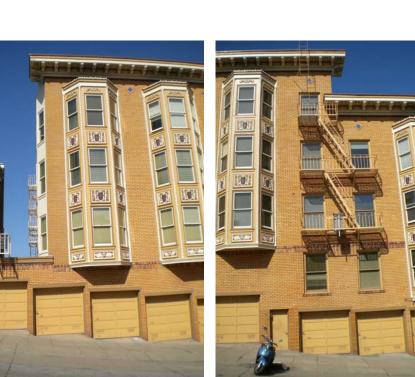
PHOTO ARRAY - OPPOSITE SIDE OF STREET 2
